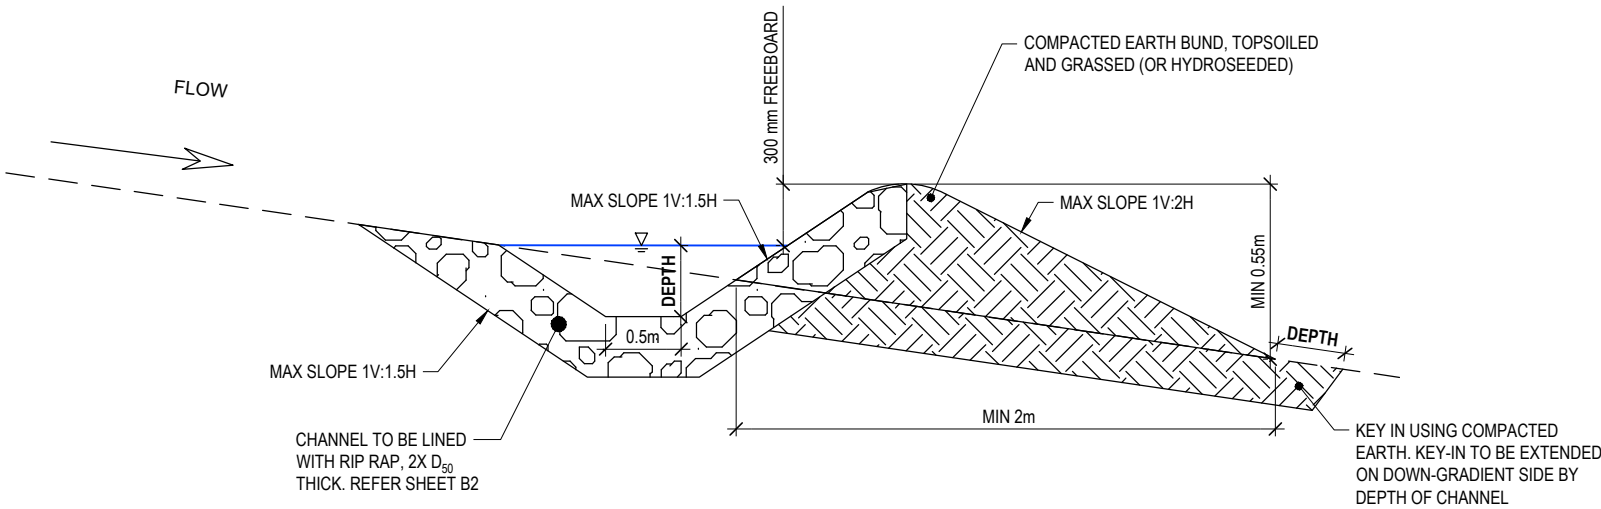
TRAPEZOIDAL CHANNEL CROSS-SECTION WITH BASE WIDTH = 0.5 m
